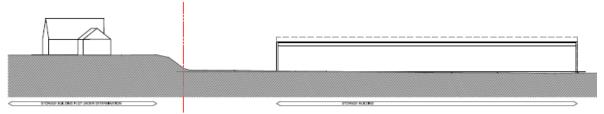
Proposed section of proposed storage building relative to the existing dwellings to the rear of the site.
